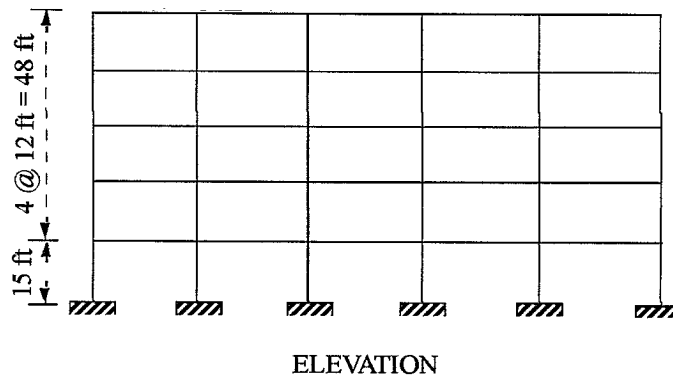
(c). Elevation of Residential Building Studied – All Buildings
